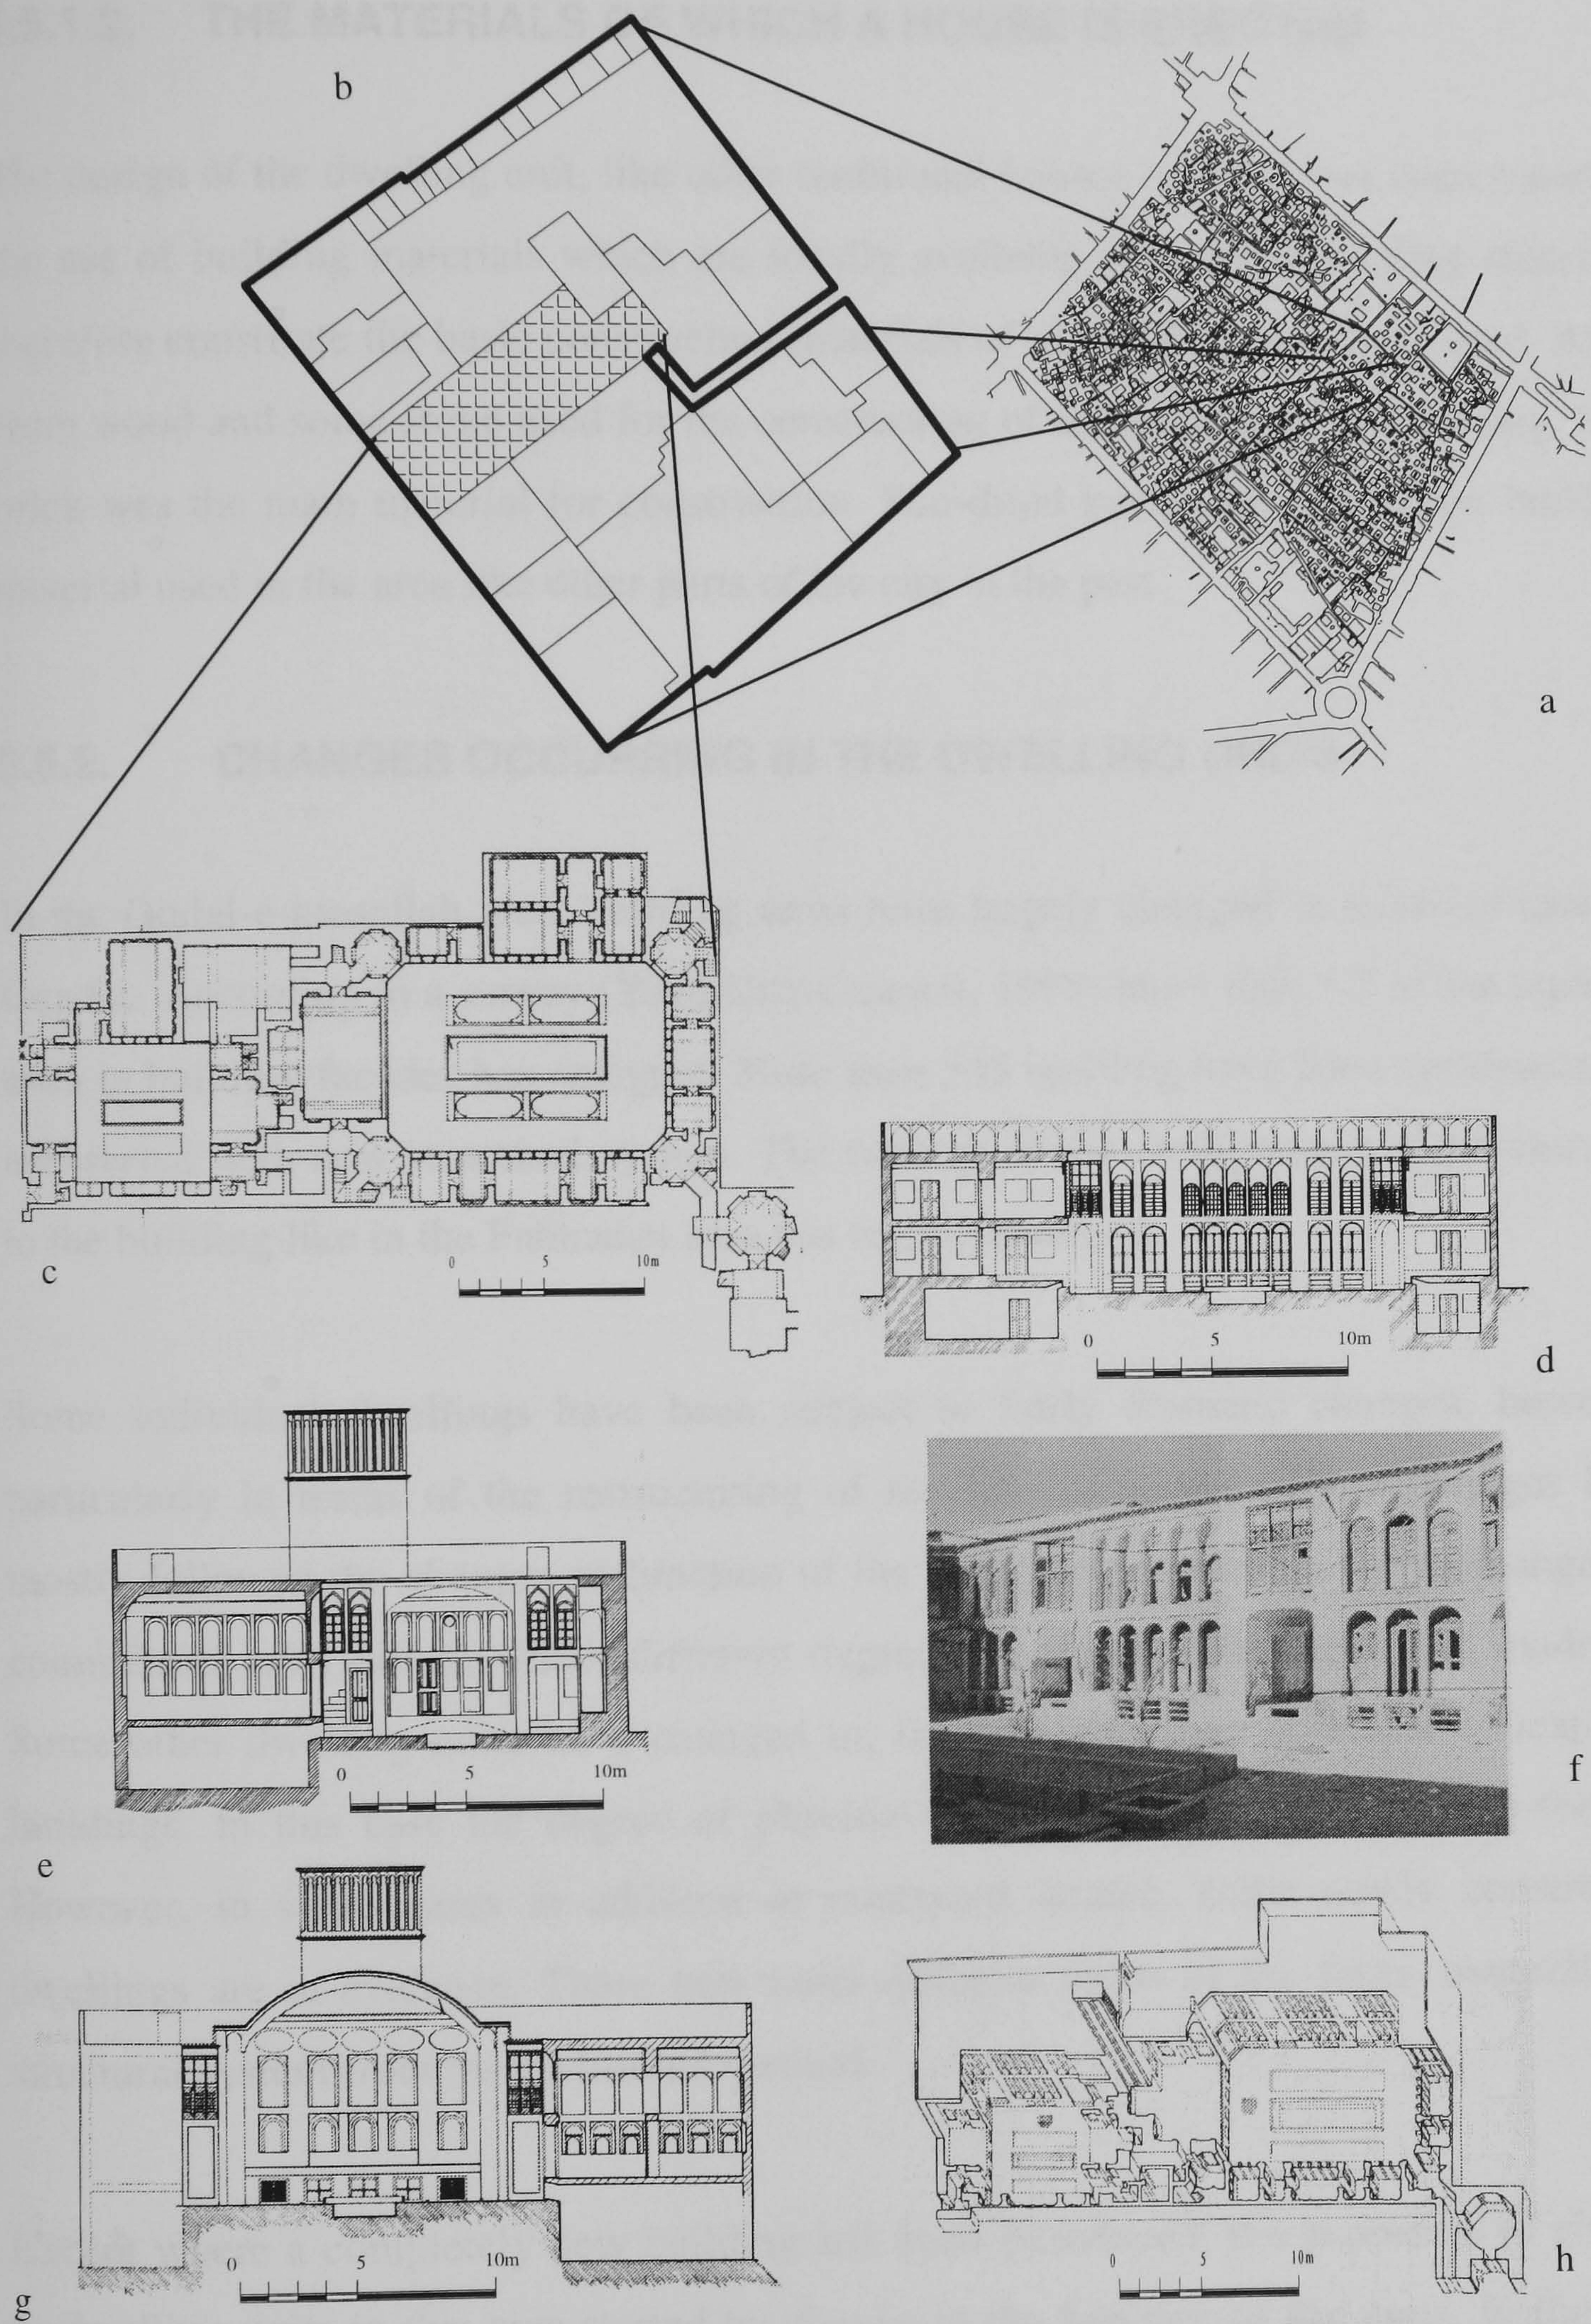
THE TRADITIONAL TYPICAL HOUSE IN THE GODAL-E-MOSALLAH AREA. A- LOCATION OF THE TYPICAL HOUSE IN THE AREA. B- THE LOCATION OF THE HOUSE IN THE BUILDING GROUP C- THE BASIC PLAN FORM OF THE HOUSE D,E,F,G - SECTIONAL ELEVATION AND GENERAL TREATMENT OF THE INTERNAL FAÇADE OF THE UNITS H- SECTIONAL AXONOMETRIC VIEW OF THE HOUSE (Source: Organisation of Cultural Heritage in Yazd)
